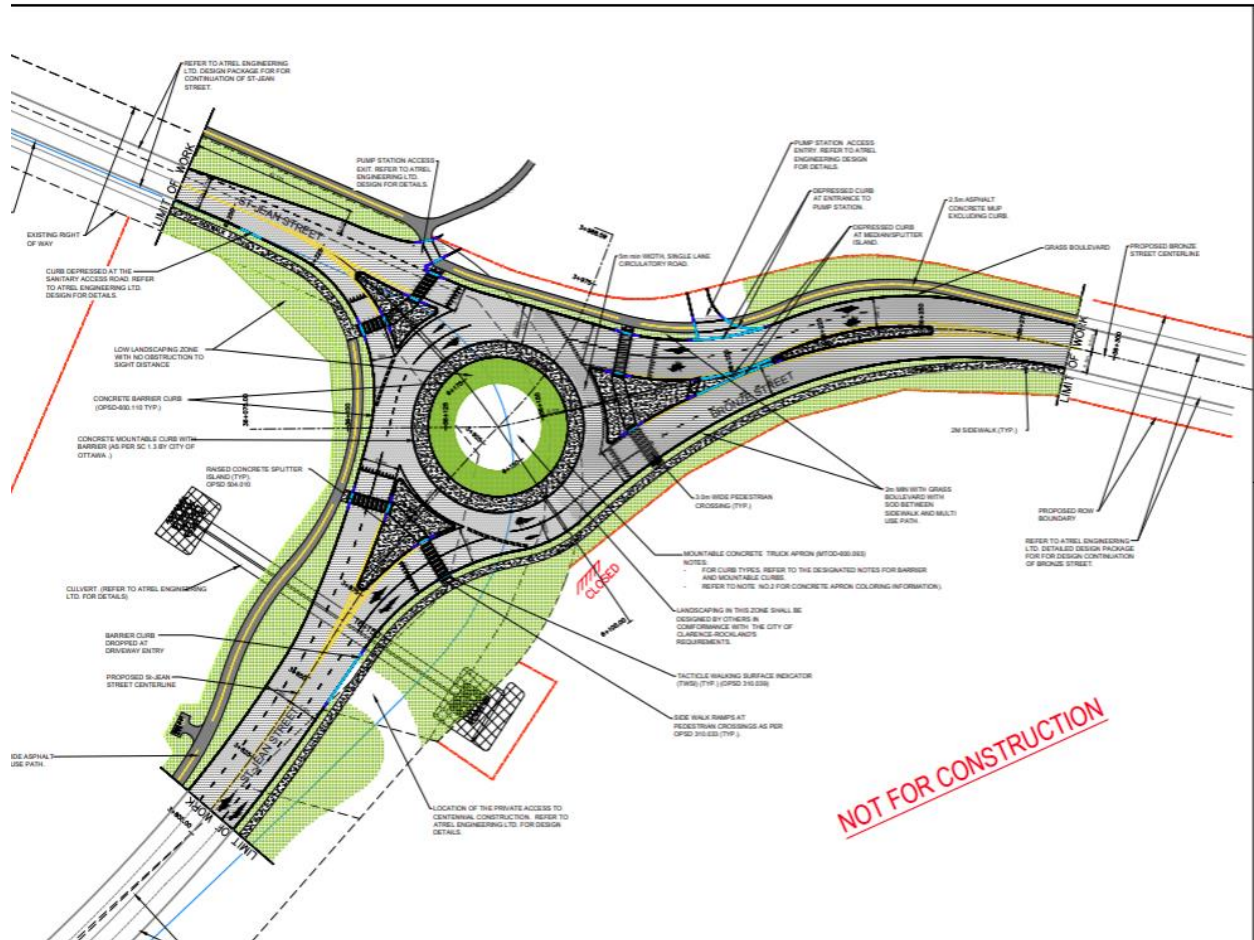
Design of the roundabout at the corner of St-Jean Street and Bronze Avenue.
